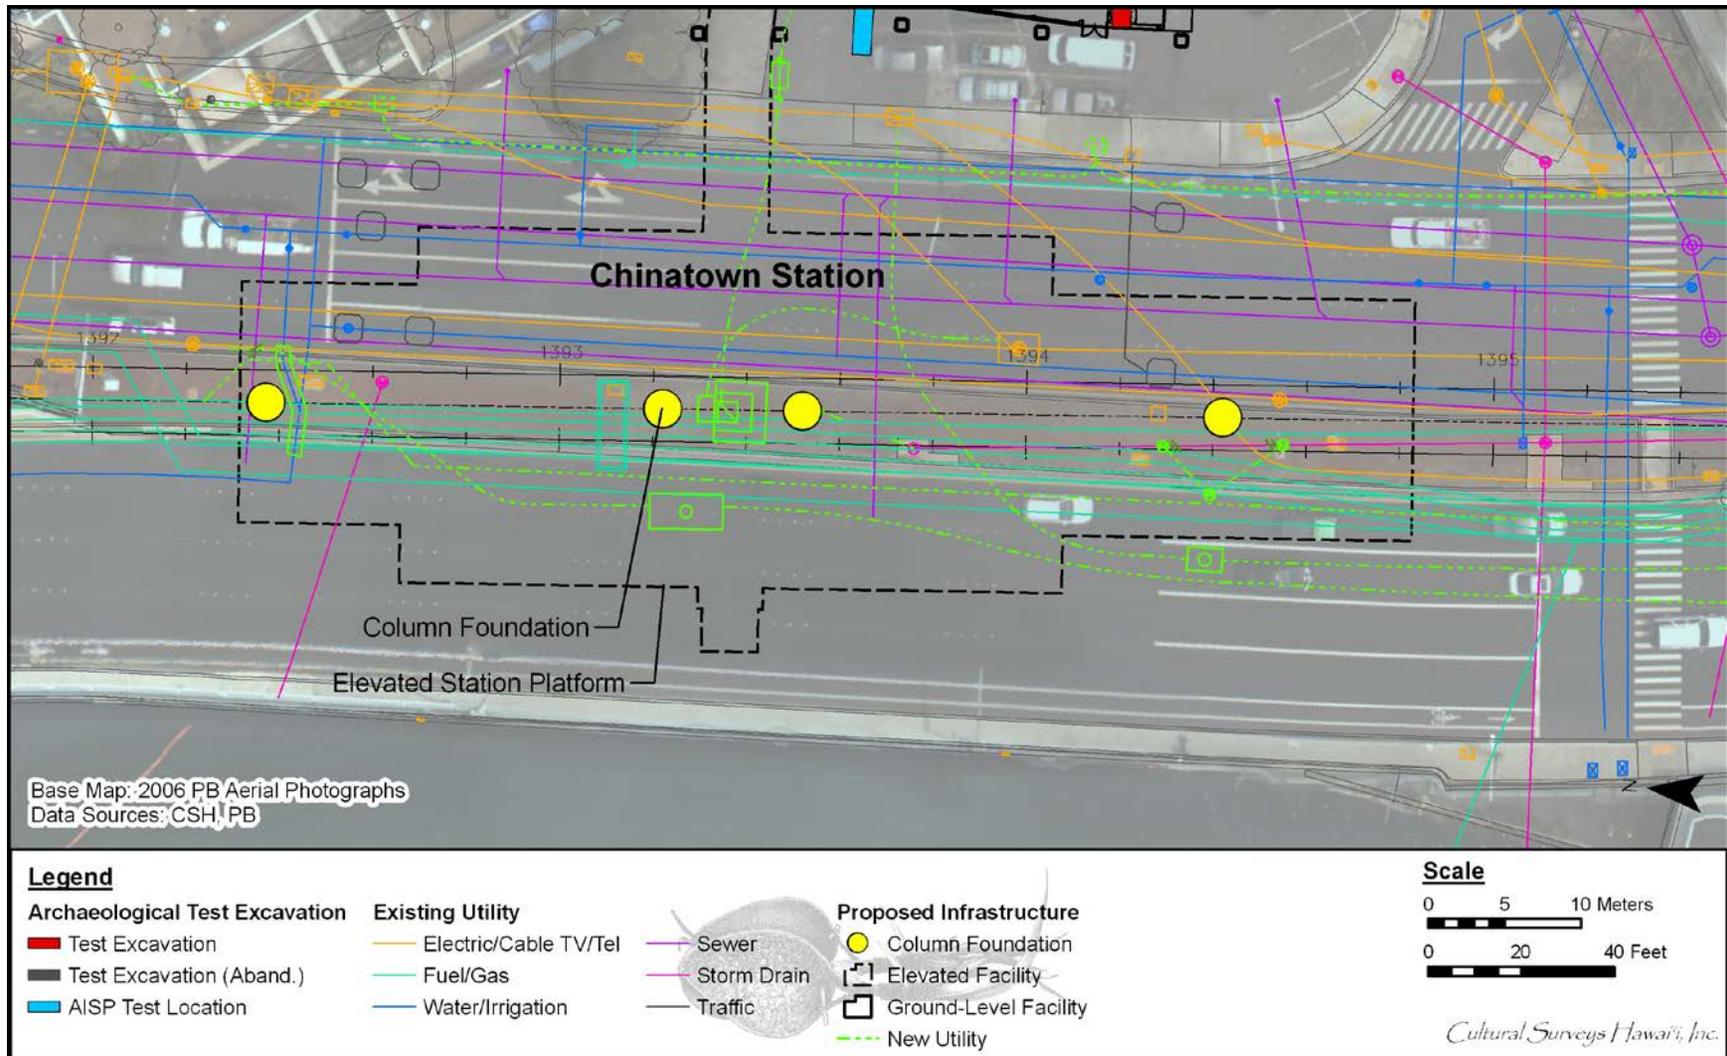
Chinatown Station detail of column foundation layout showing that no testing was conducted of the four column foundations, due to their location seaward of the former coastline and constraints
